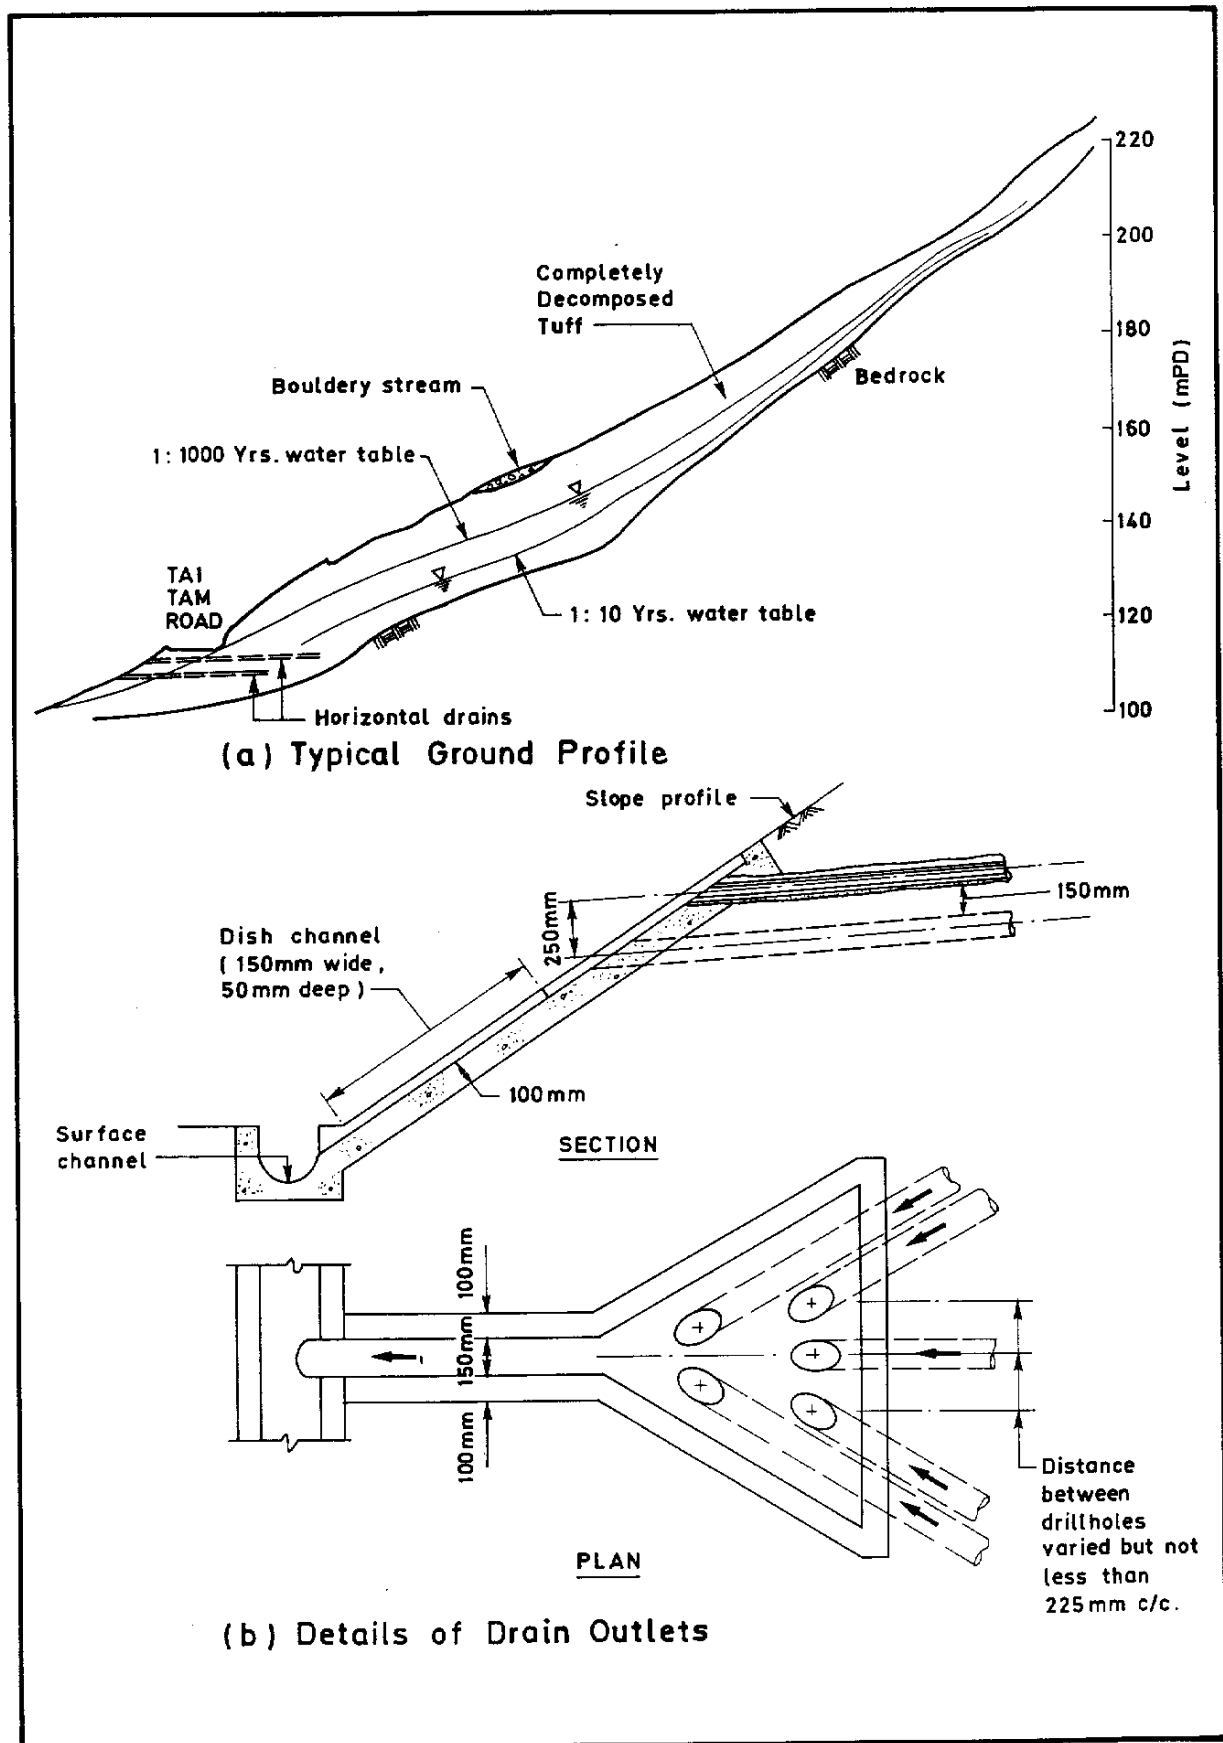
Typical Section and Details of Drain Outlets at Hing Man Estate
